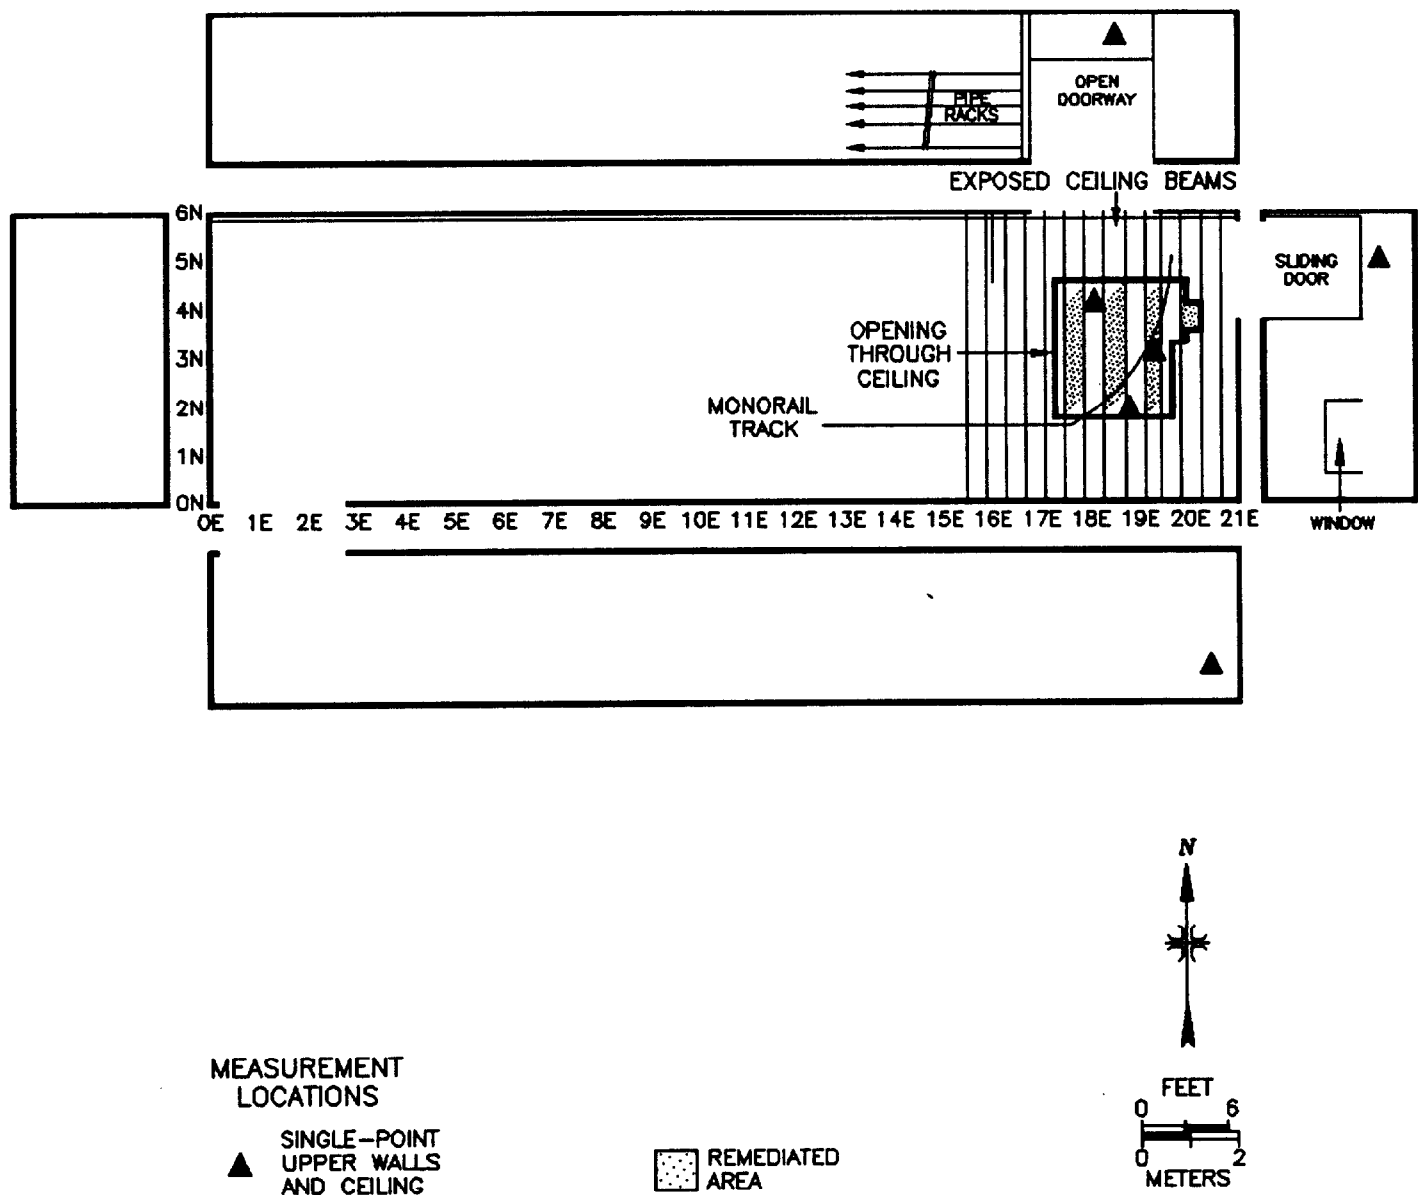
Building 5, Plumbing Shop Ceiling and Upper Walls – Remediated Areas and Measurement Locations
